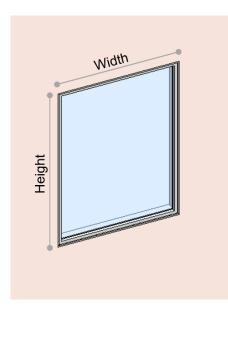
Building Envelope Elements (Reference: www.iko.com)
